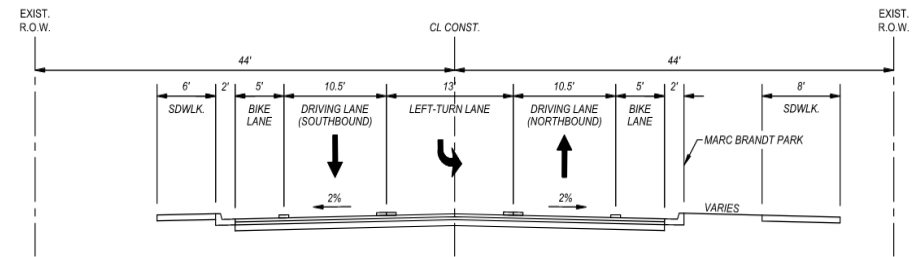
, Proposed Typical Sections from Siringo Road to James Street – Build Alternative 1
